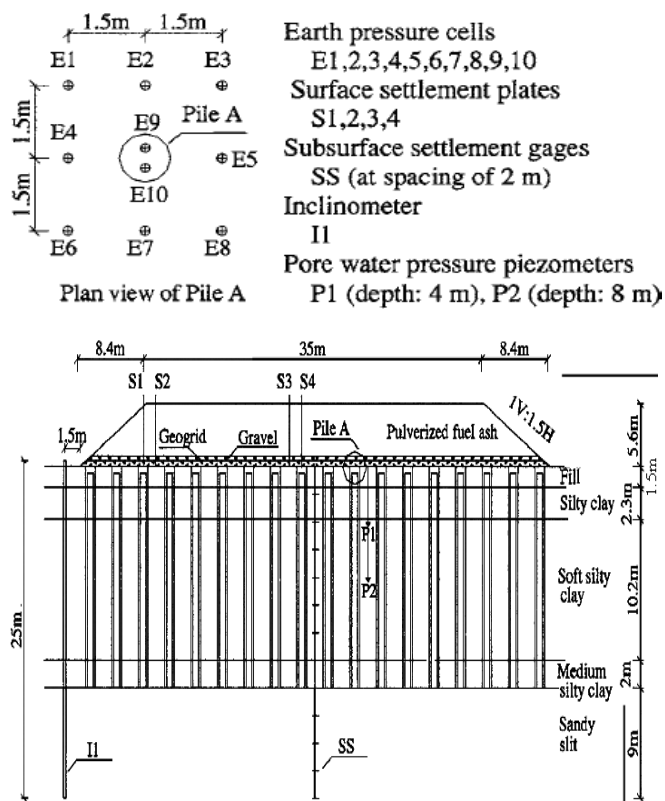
Plan and cross section of instrumented embankment (after Liu et al. 2007)
